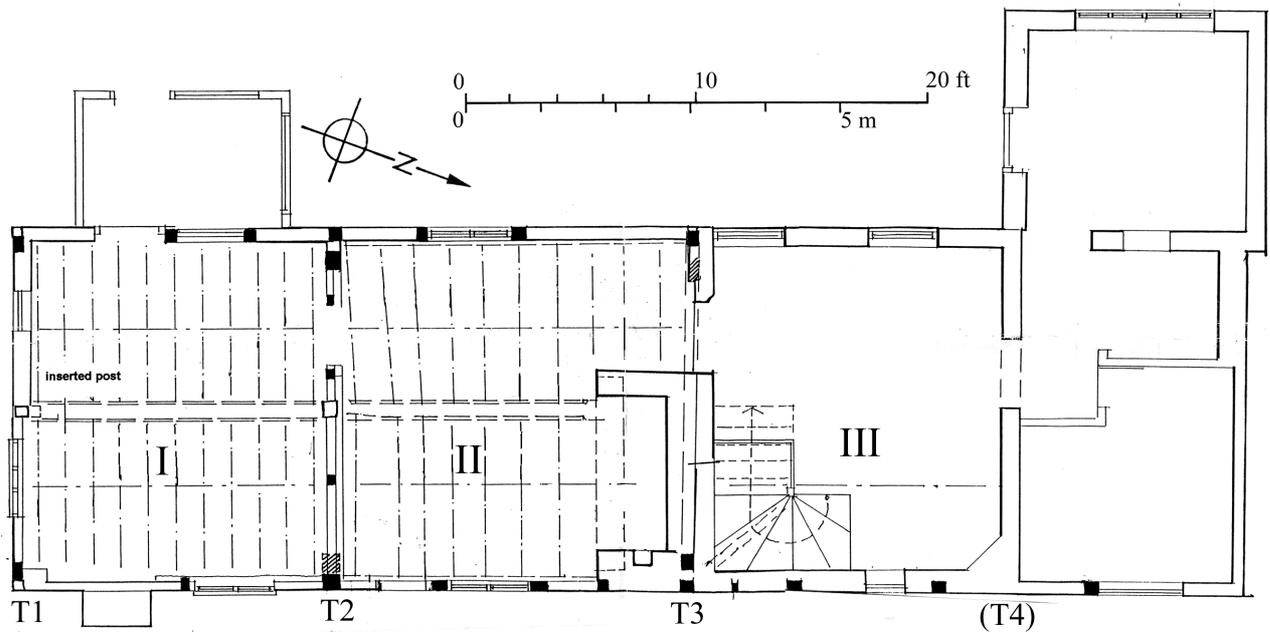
Plan, showing truss and bay numbering (from a survey by Paul Woodfield).
